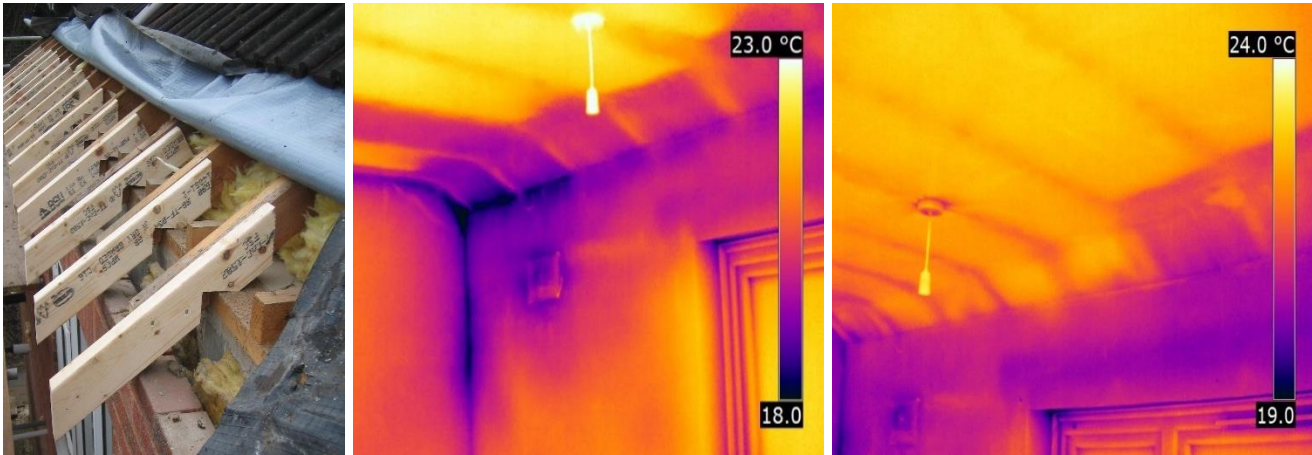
Extension of eaves to ensure continuation between the LI and CWI (left) causing thermal bridging on the ceiling eaves (centre) which can be avoided by joining the LI to the CWI (right) [50]
